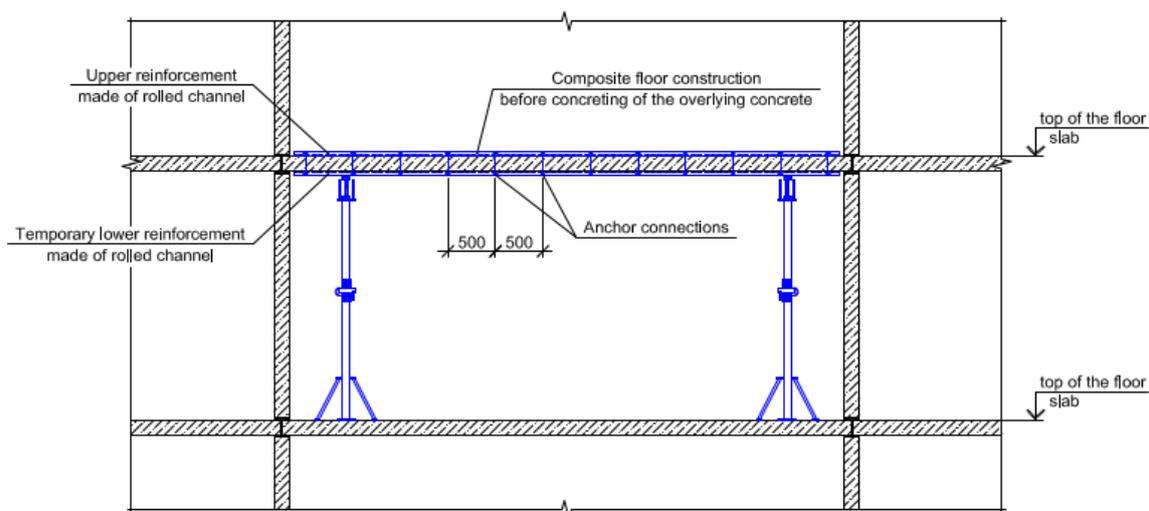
Scheme of composite elements formed by the floor slab and external reinforcement using rolled steel channels
